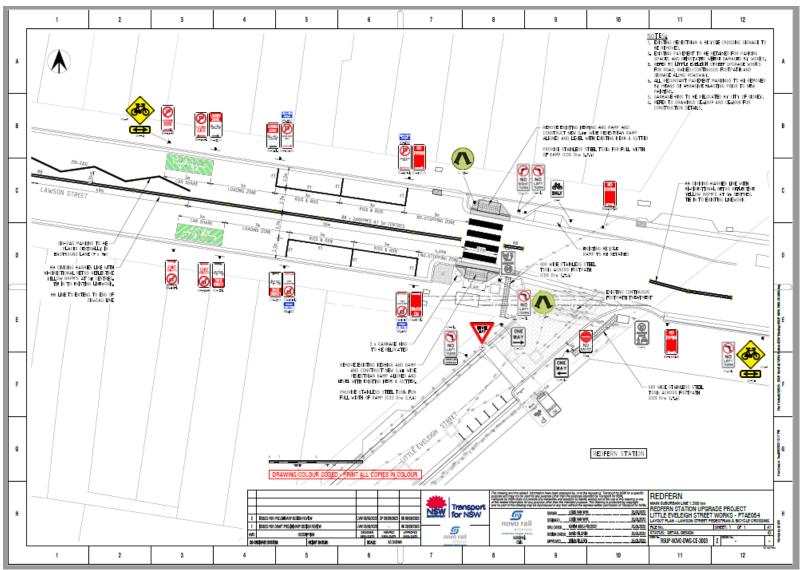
Redfern Station Upgrade Project Little Eveleigh Street Works - Ptae054 - Layout Plan - Lawson Street Pedestrian & Bicycle Crossing.
